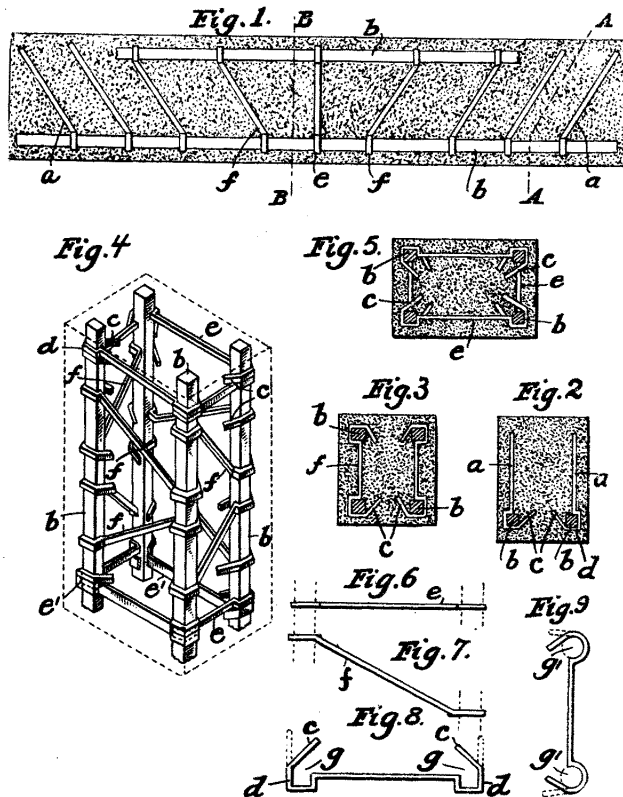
shows a girder in which the anchor-member *a* is formed at one end, so as to fit snugly around the main reinforcing bar *b*, on three sides; and this end terminates in a finger *c* which lies in prolongation of the side *d* when the anchor-bar is placed upon the reinforcing bar *b* and before the concrete is placed.
